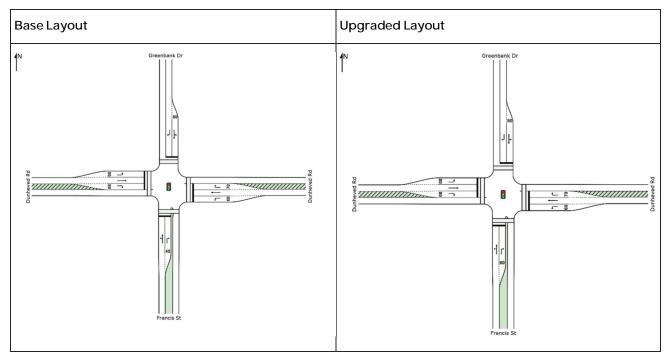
2026 with Links Road extension - Dunheved Road, Greenbank Drive and Francis Street
